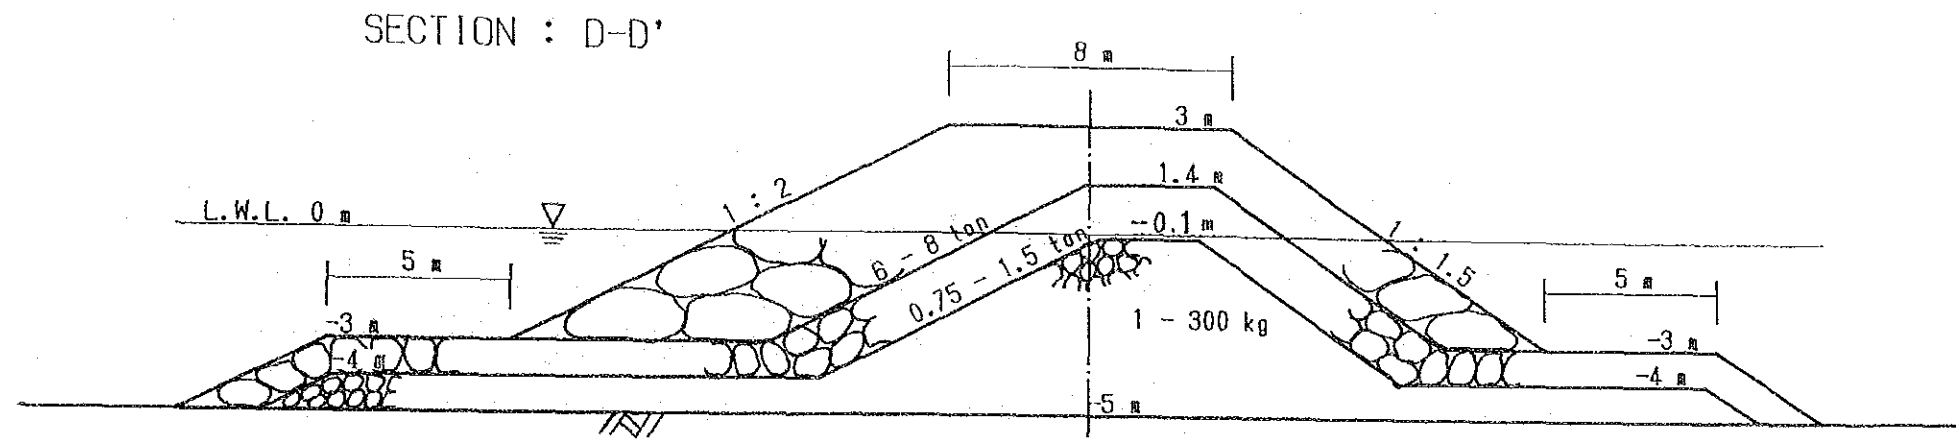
(2) Typical Cross Sections [New Sub-breakwater]
